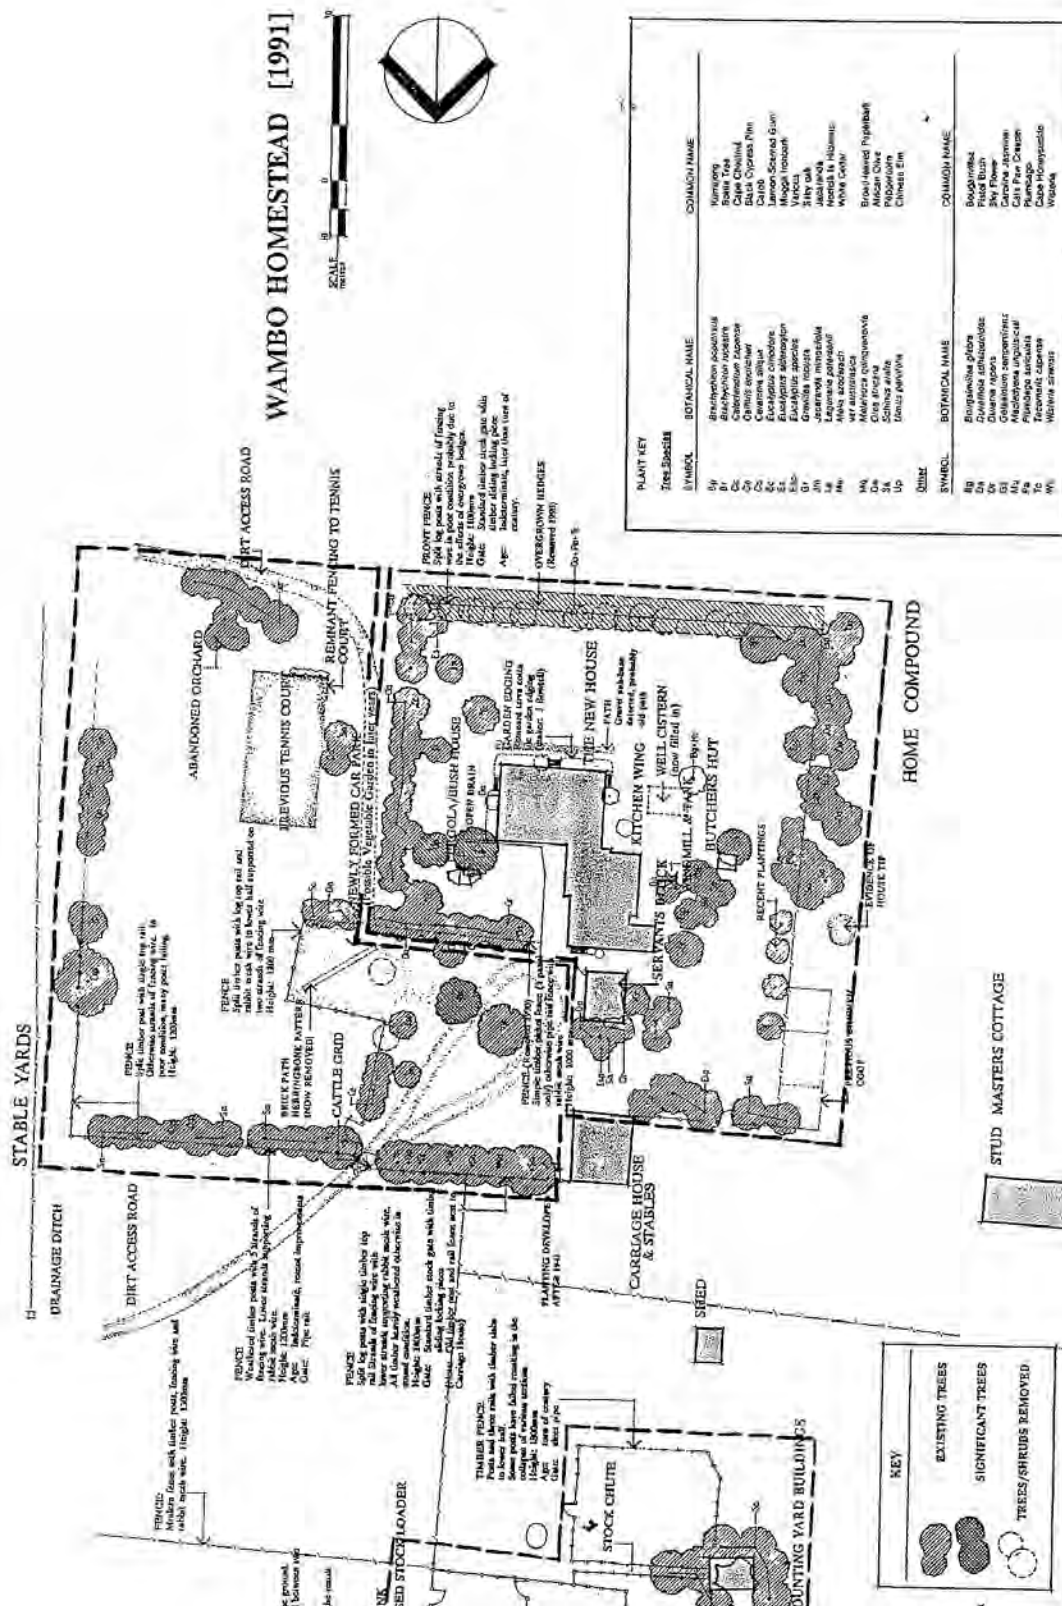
Wambo Homestead Complex site plan, showing major site components referred to in this report. (Source: Wambo Homestead—Landscape Overview (Drawing 10) from Wambo Homestead—A Conservation Plan, by B Collins, 1994, p.196)
